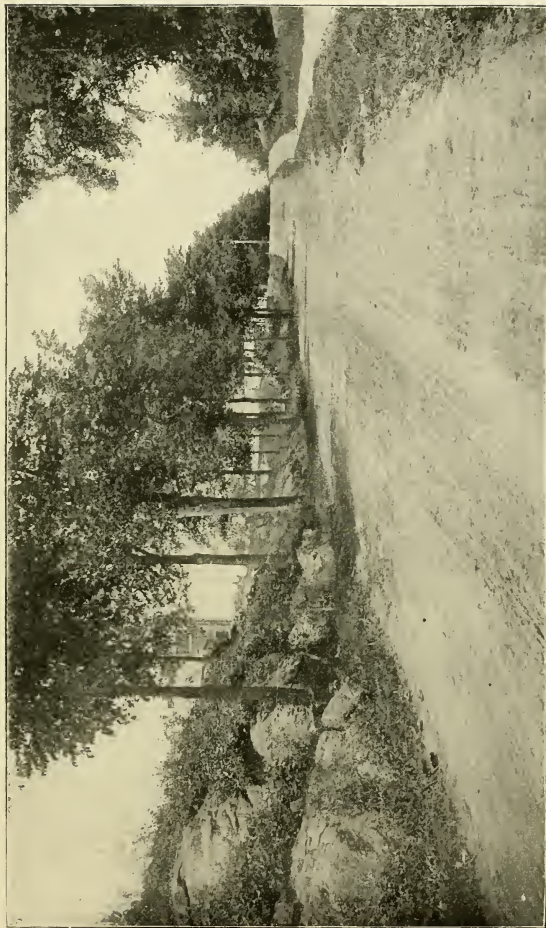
ROAD BEFORE RECONSTRUCTION. (*From Photograph.*)
